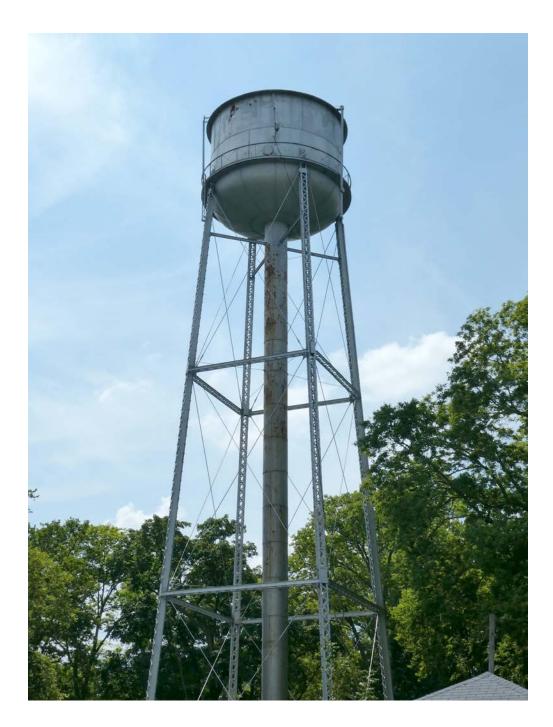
Sidell Elevated Water Storage Tank, facing southwest.
